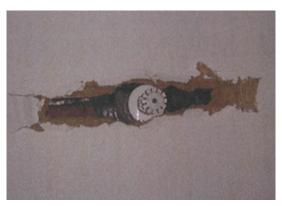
Damage to ceiling tile from an unrestrained fire protection system.
